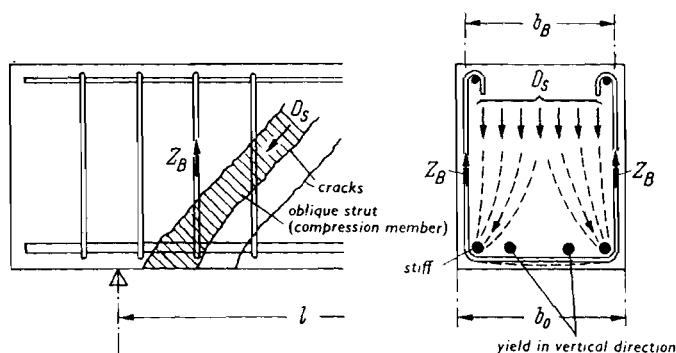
The oblique "strut" suspended from stirrups is somewhat like a deep beam supported on the longitudinal bars at the bottom corners of the section; the longitudinal bars between the corner bars are yielding.
